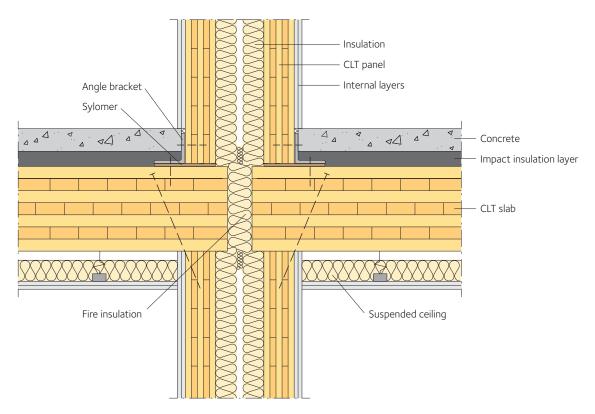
Vertical section for building with high demands, regarding sound insulation. Joint flooring to load-bearing apartment separating wall.
